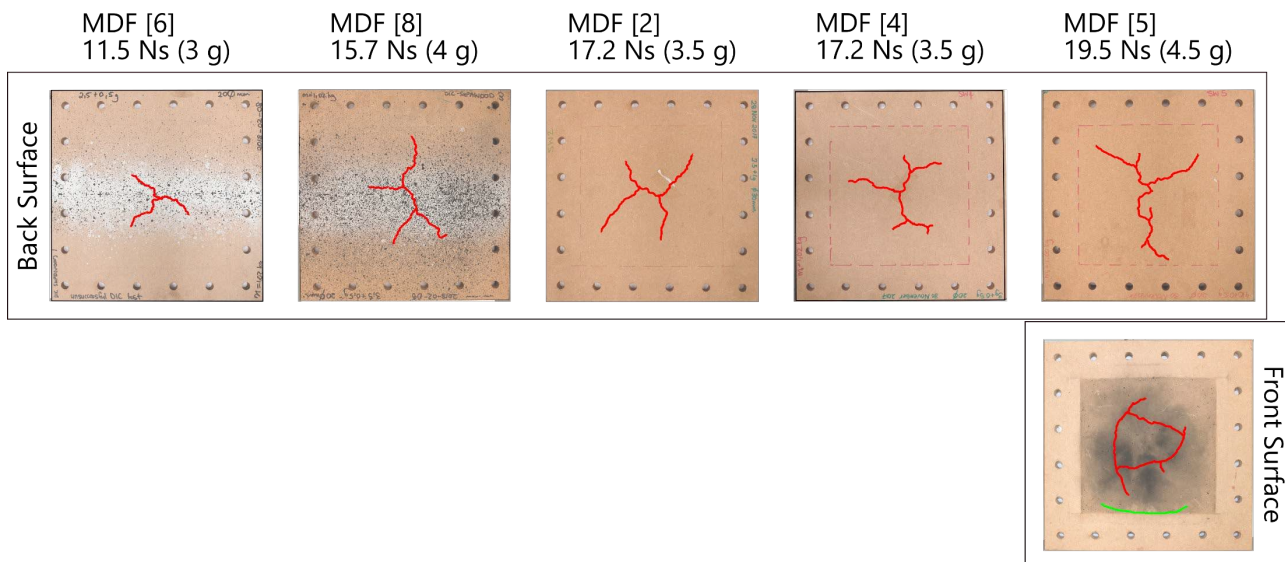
Cracking patterns on the front and rear surfaces of the blast-tested panels (shown in red)
